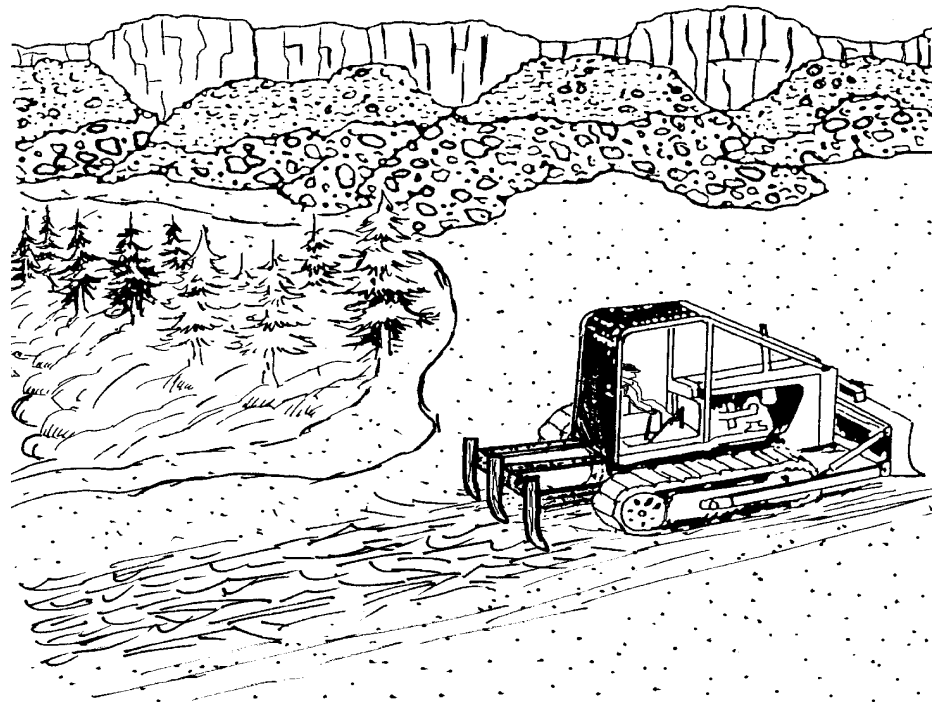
Ripping or decompaction of pit floors is typically accomplished with rippers mounted on heavy equipment.
